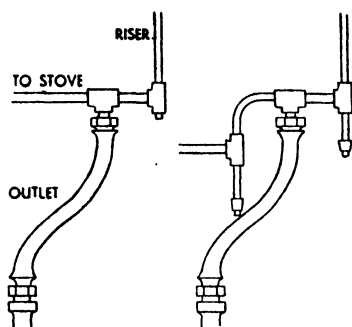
(Right) Typical arrangement in small cellar or stair cupboard. (Left) Improved arrangement.
